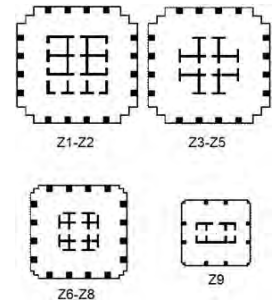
Typical layout plan for Scheme 5 (Source: Guangjing Sha)
